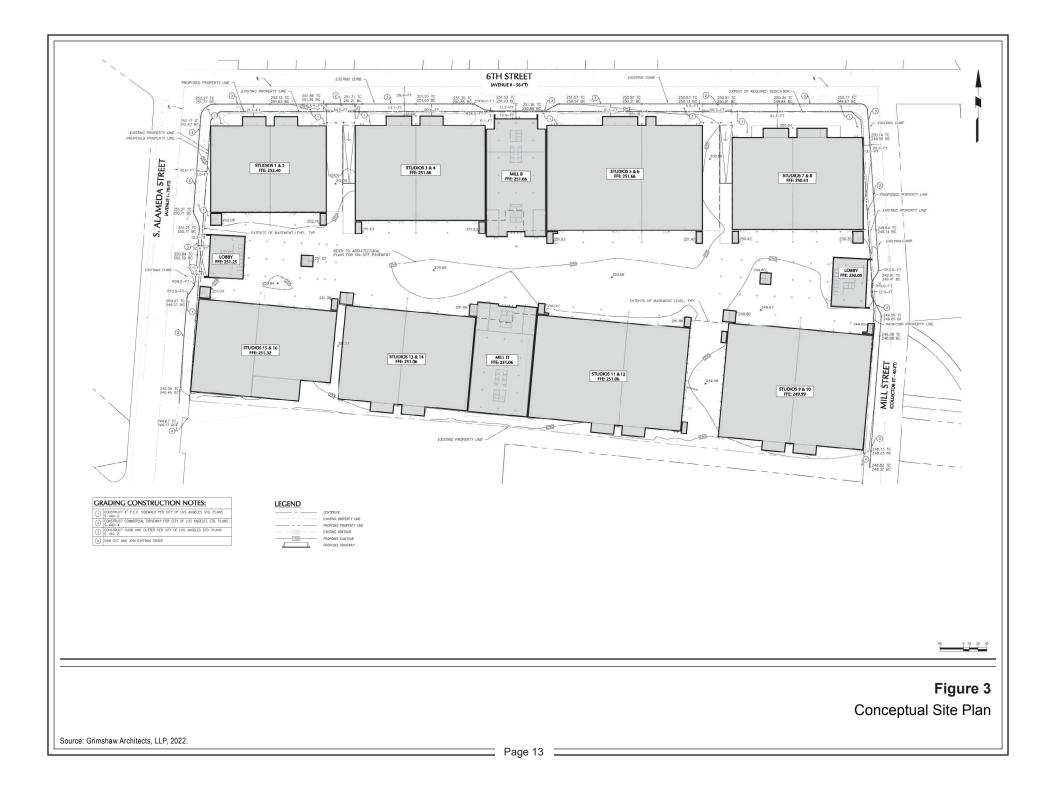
on page 13, the Project would include a total of 21 separate structures, including eight soundstages, eight support buildings, four office buildings, and one parking structure.
